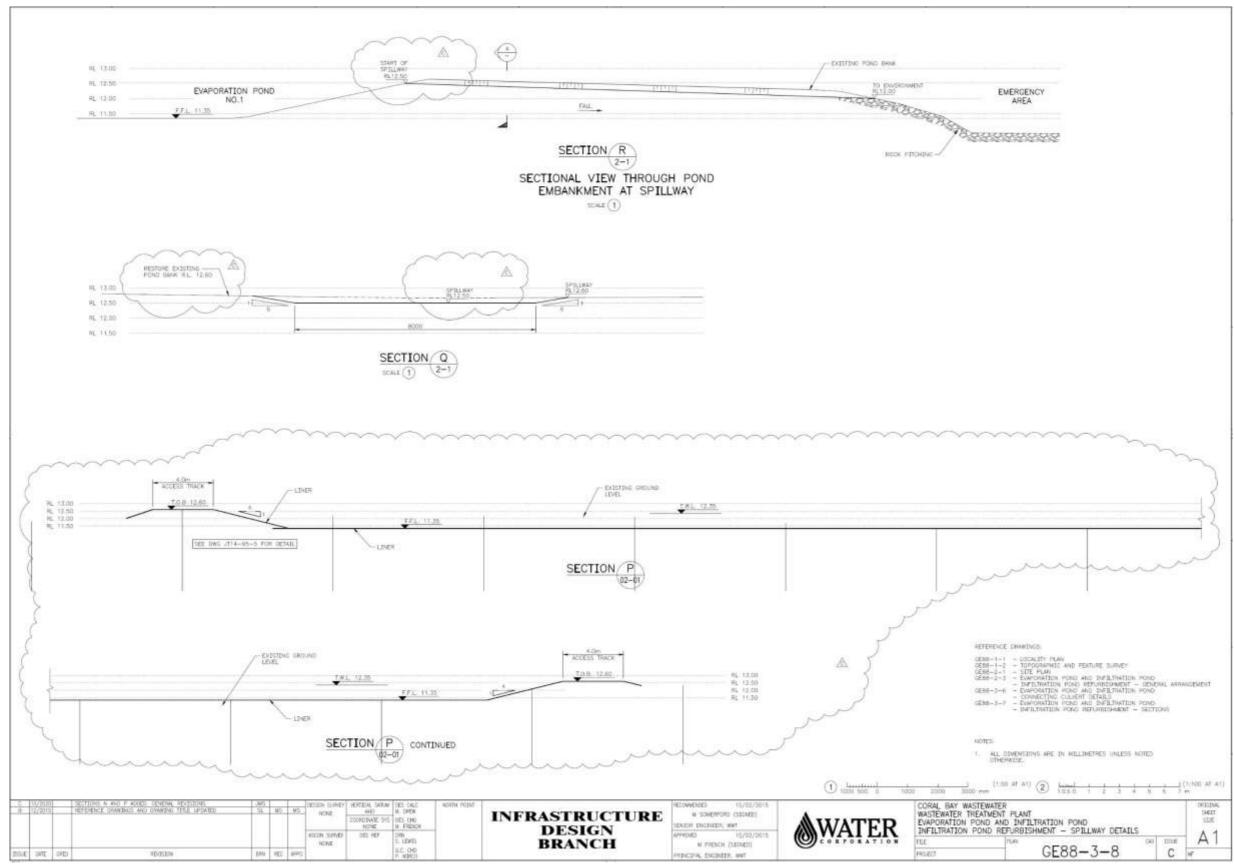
Coral Bay Wastewater Treatment Plant evaporation pond and infiltration pond refurbishment - spillway details - plan GE88-3-8
